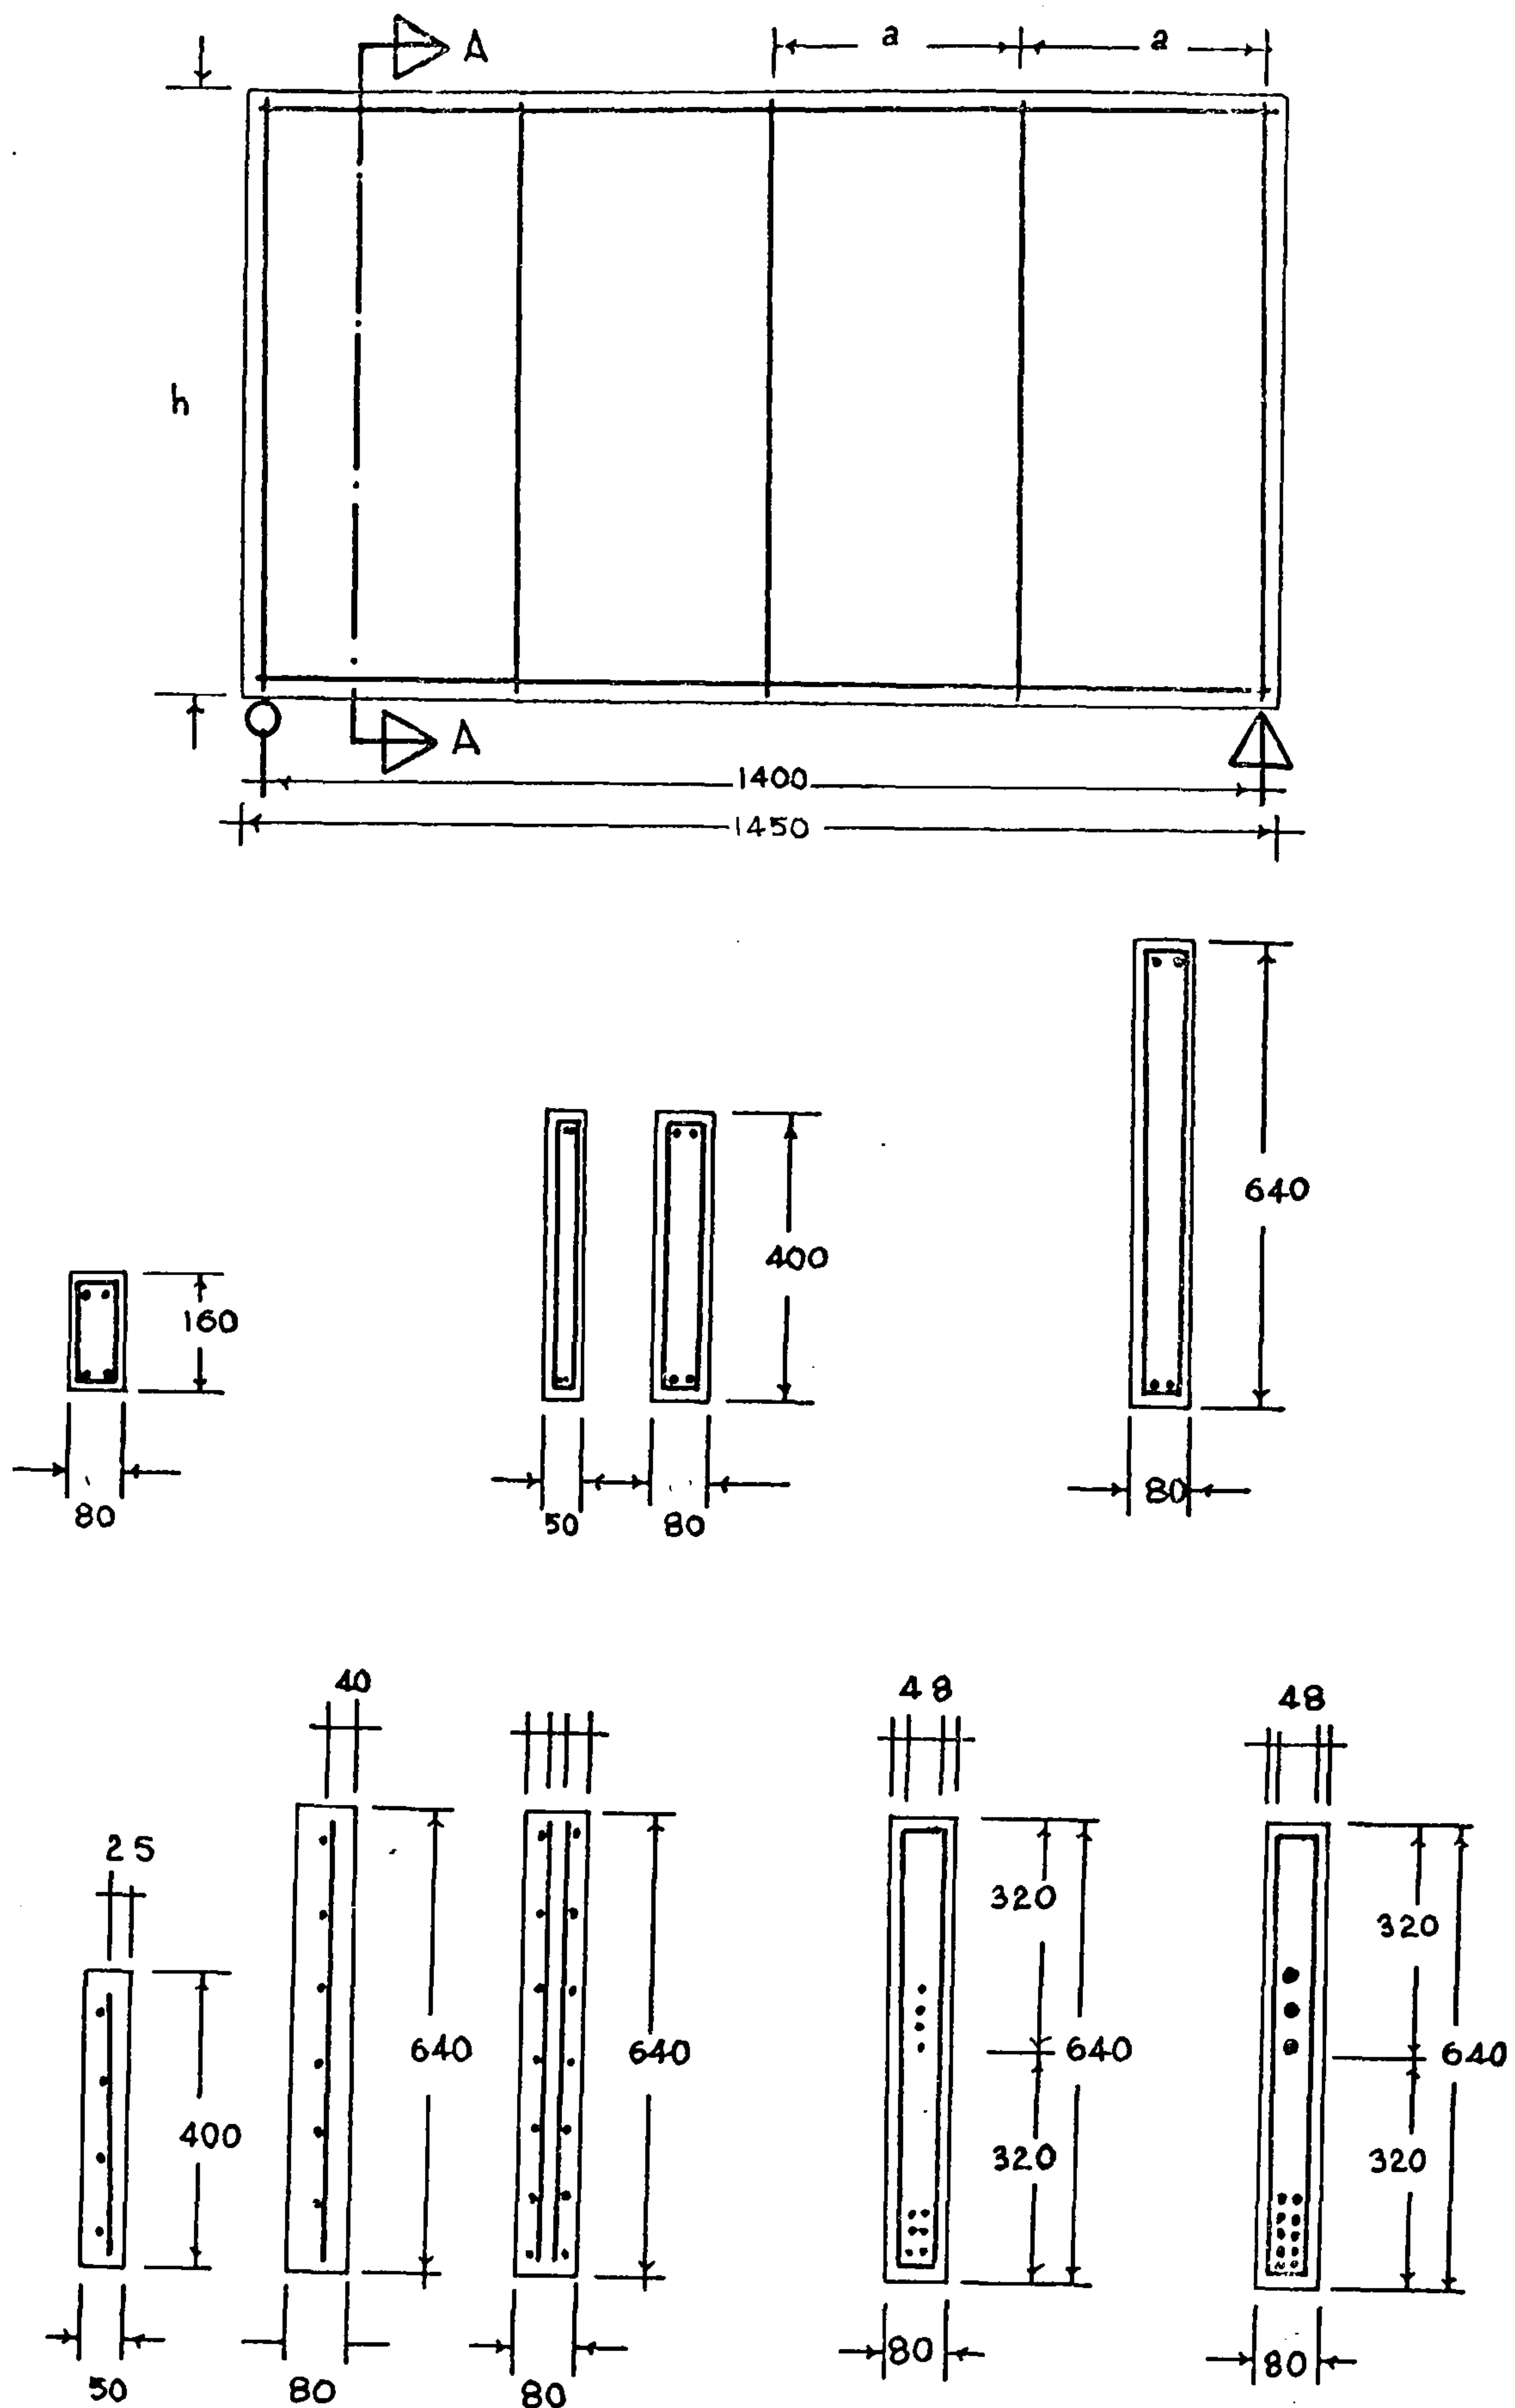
DIMENSIONS AND REINFORCEMENT DETAIL OF SPECIMENS HEATED FROM THREE SIDES DESCRIBED IN TABLES 2.5 - 2.7
